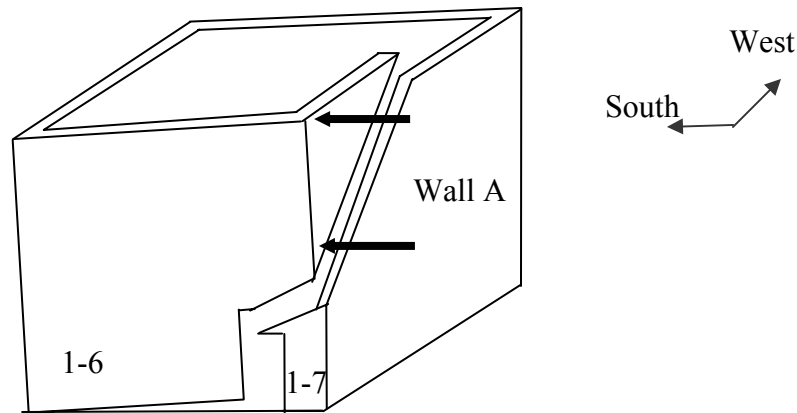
Wall 1 was separated from Wall A when it was pushed to the left (southward)
